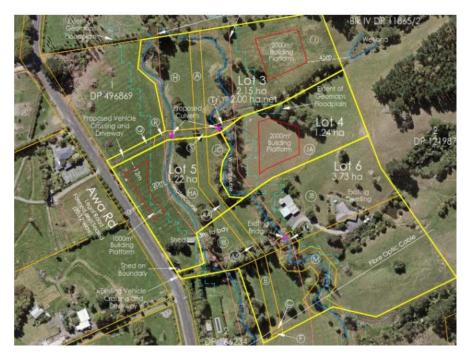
Proposed Subdivision at Awa Road, Kumeu (Proposed Lots 3, 4, 5 and 6): Source: Developers subdivision plans
